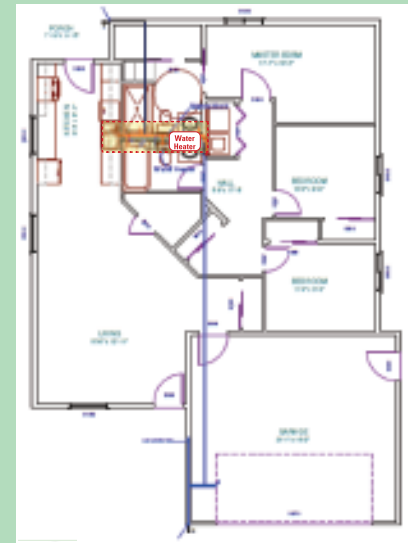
Reducing baseline hot water waste - Hot water floor plan has improved continuously with each new house design
